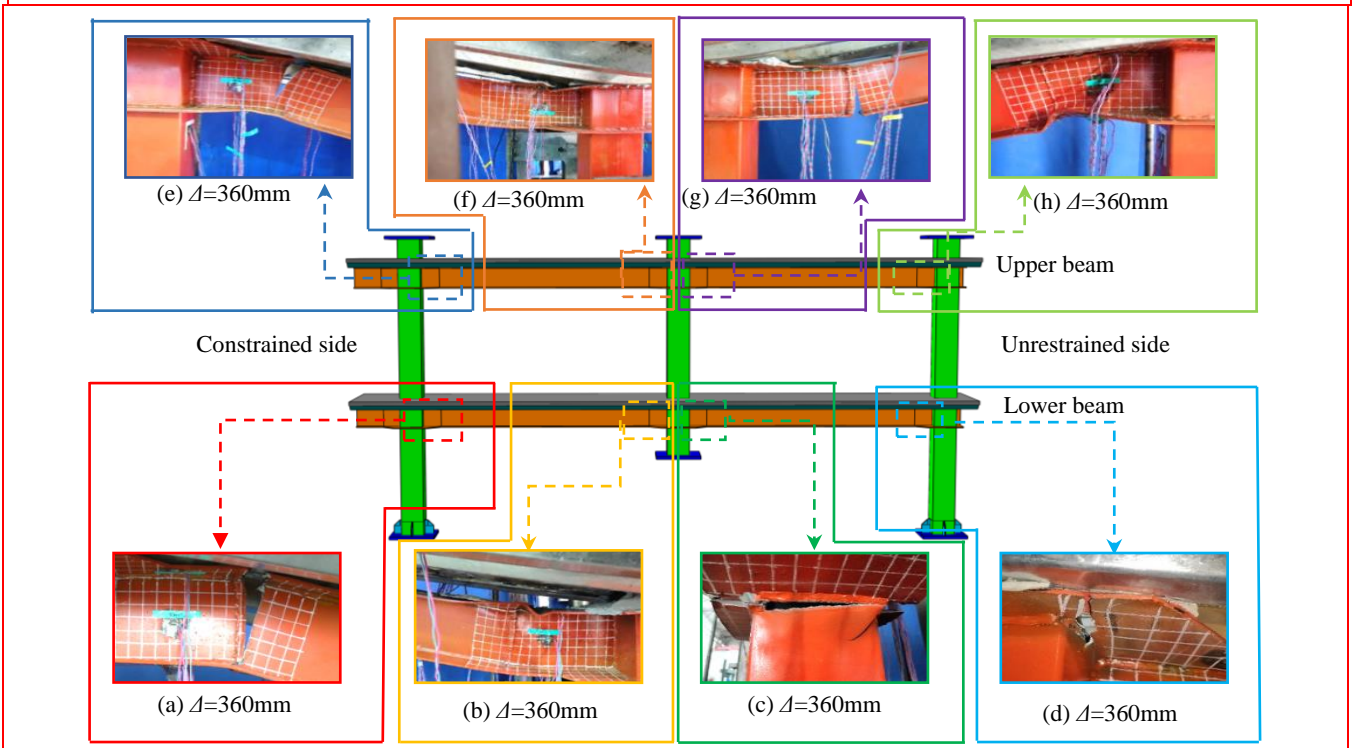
Local failure modes of steel beams (SF-2)
